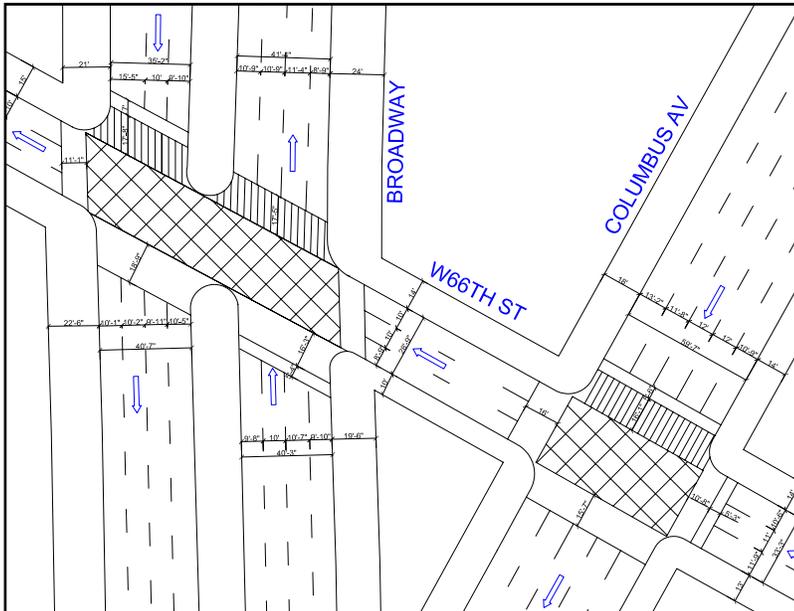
Existing Condition - W 66th Street & Broadway
